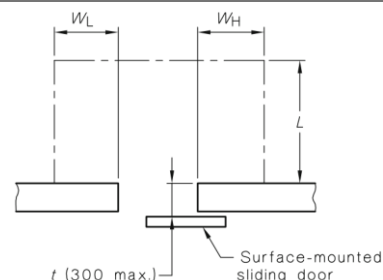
Circulation Space at Sliding Doors – Surface Mounted
